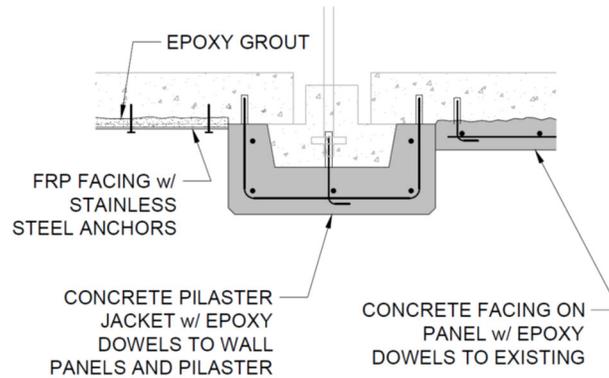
Concrete pilaster jacket (shown with concrete and FRP panel facings)
